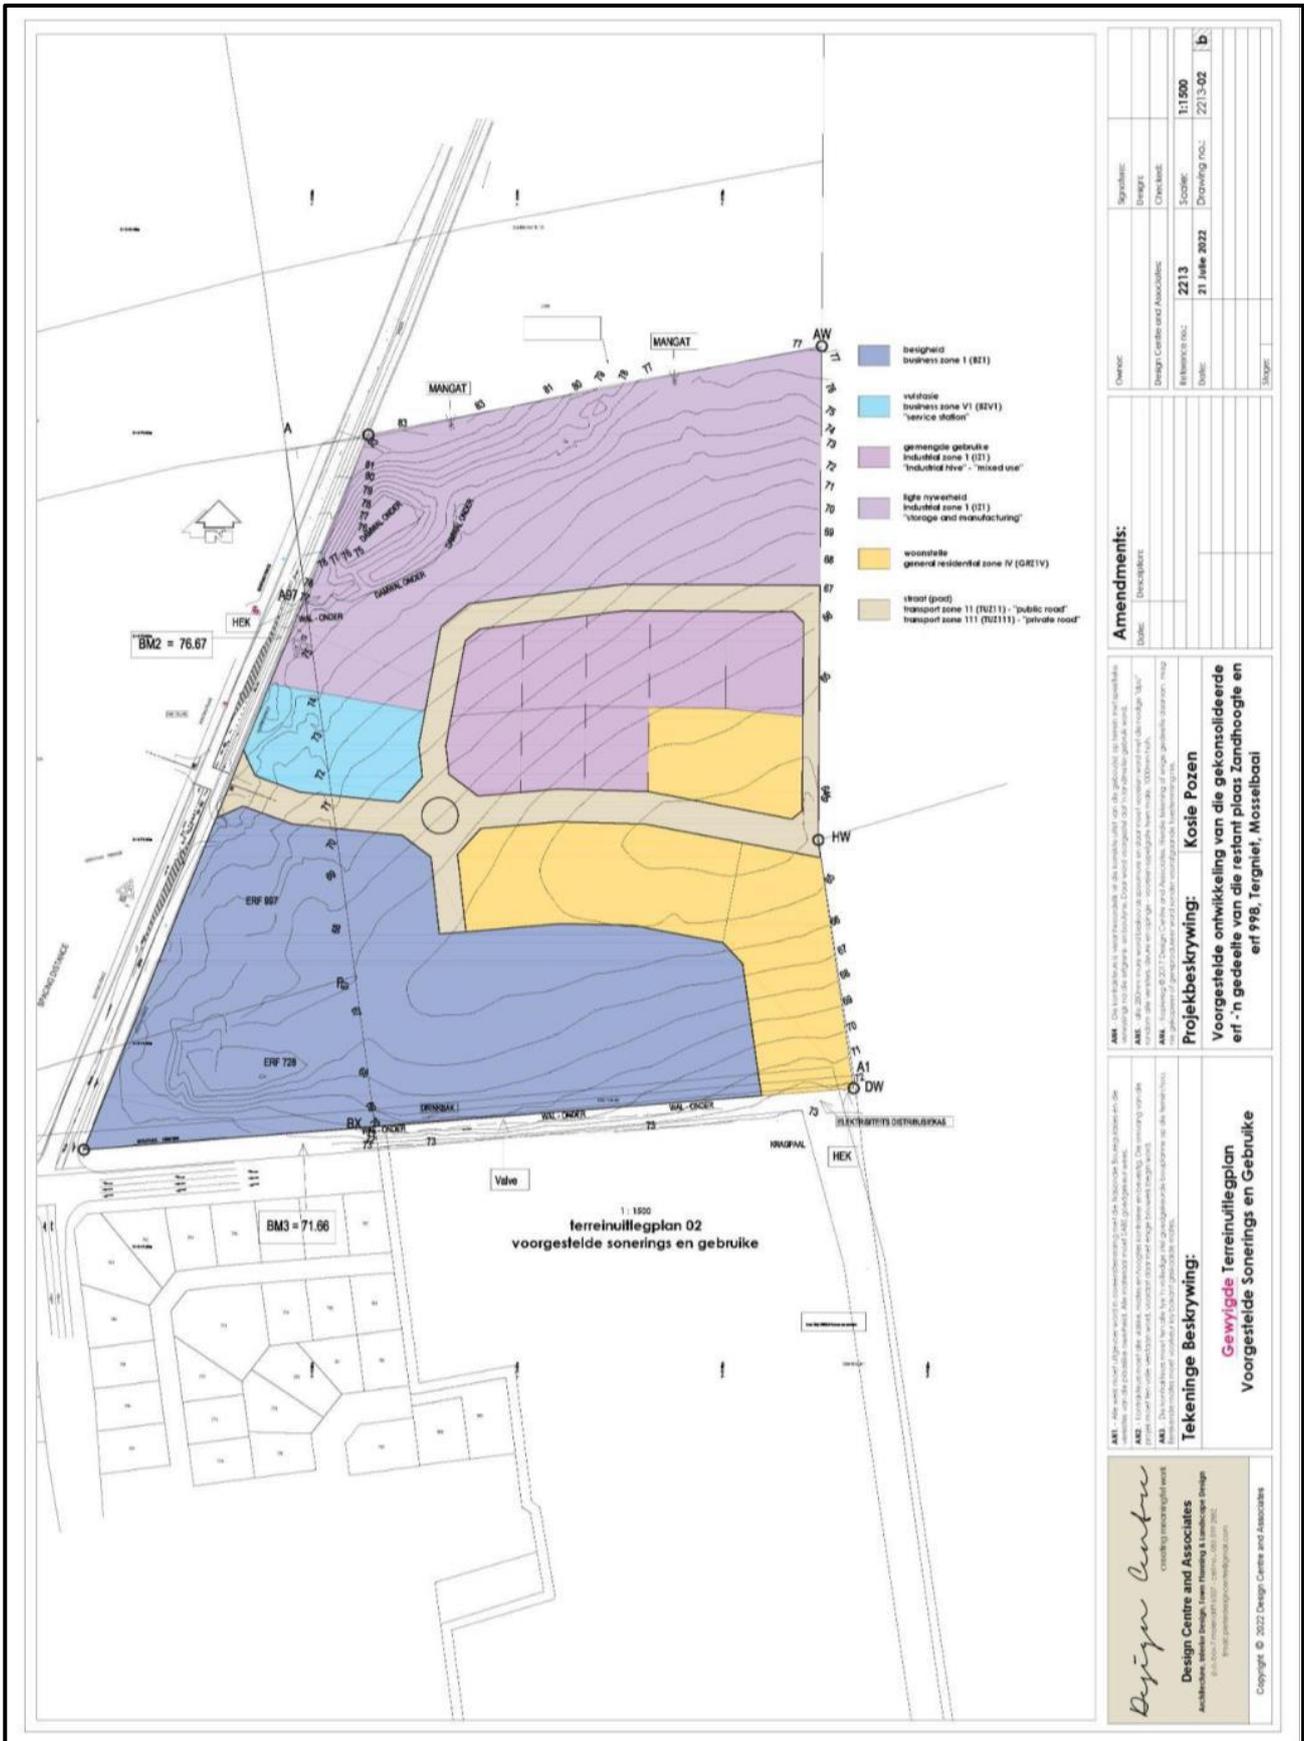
Proposed site development plan (SDP) for the study area under alternative A.
